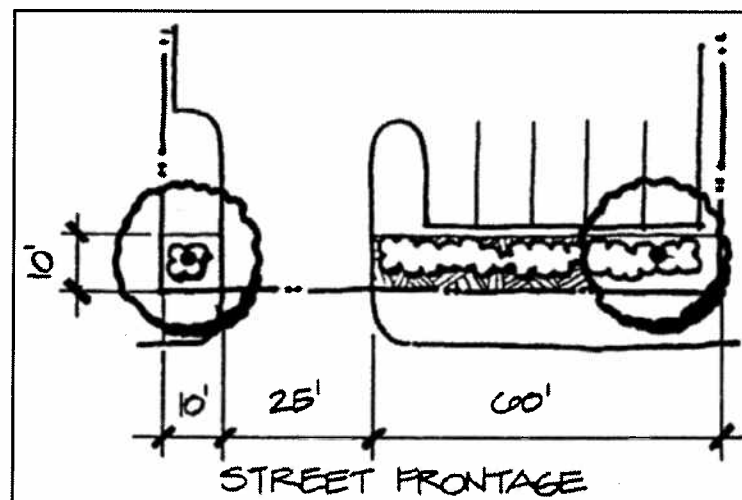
Parking Lot Landscaped Strip, Option 1
